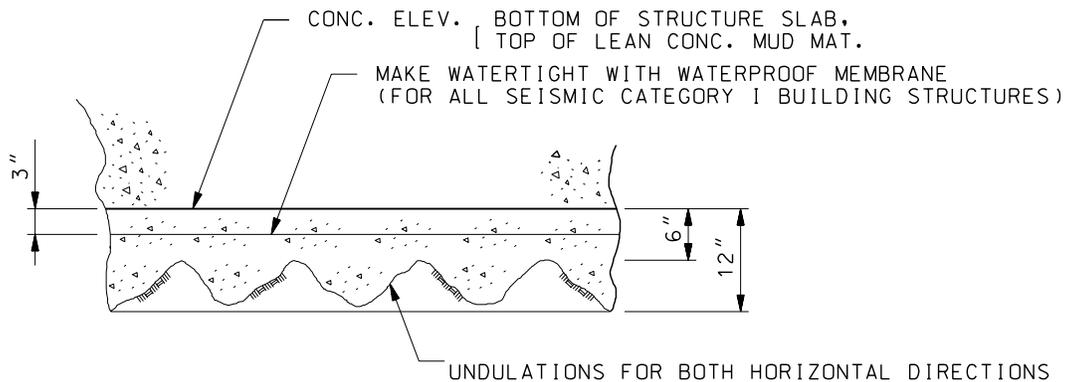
Typical Detail for Installation of Waterproofing Membrane
